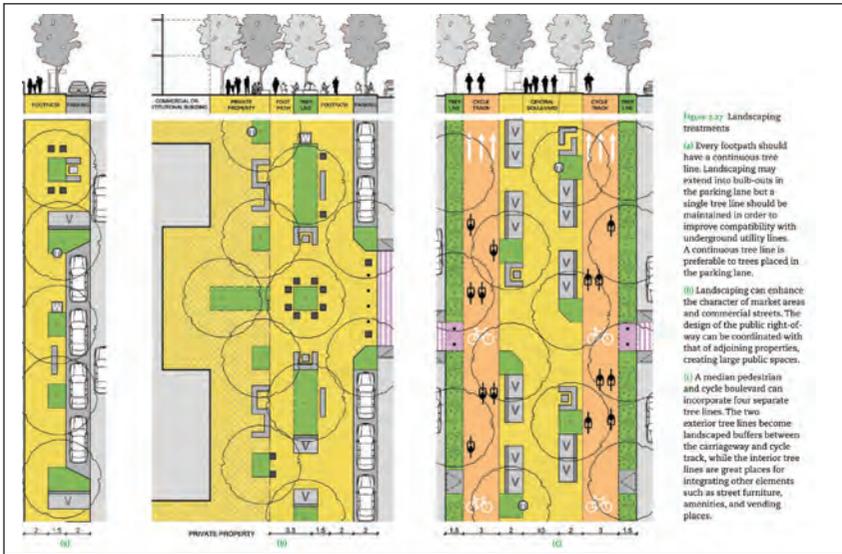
FBC for street tree plantations for better streets developed by ITDP for Indian street (Better streets, better cities: A guide to street design in urban India)
